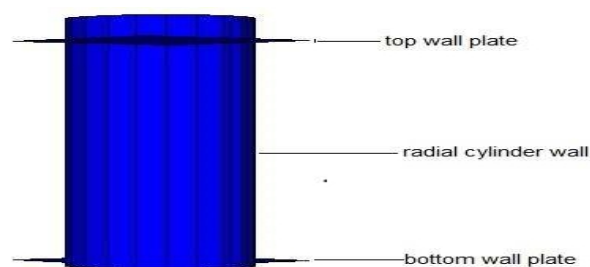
Radial cylindrical wall with top and bottom wall plates
